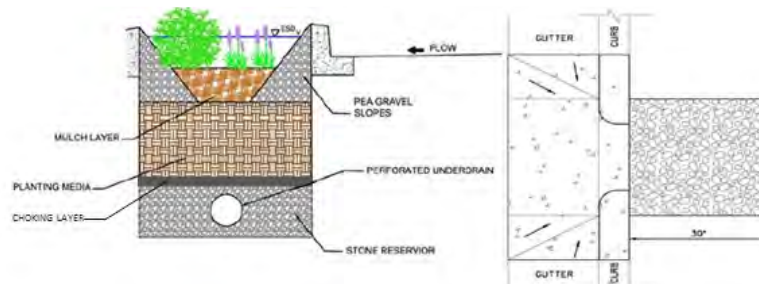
Typical Cross Section of Bioretention (MDE 2009) and Curb Cut
